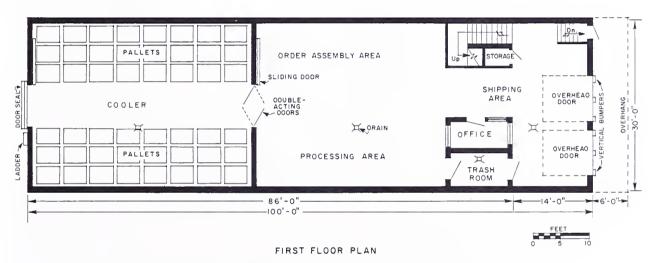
Layout of an egg firm in a multiple-occupancy building unit.
